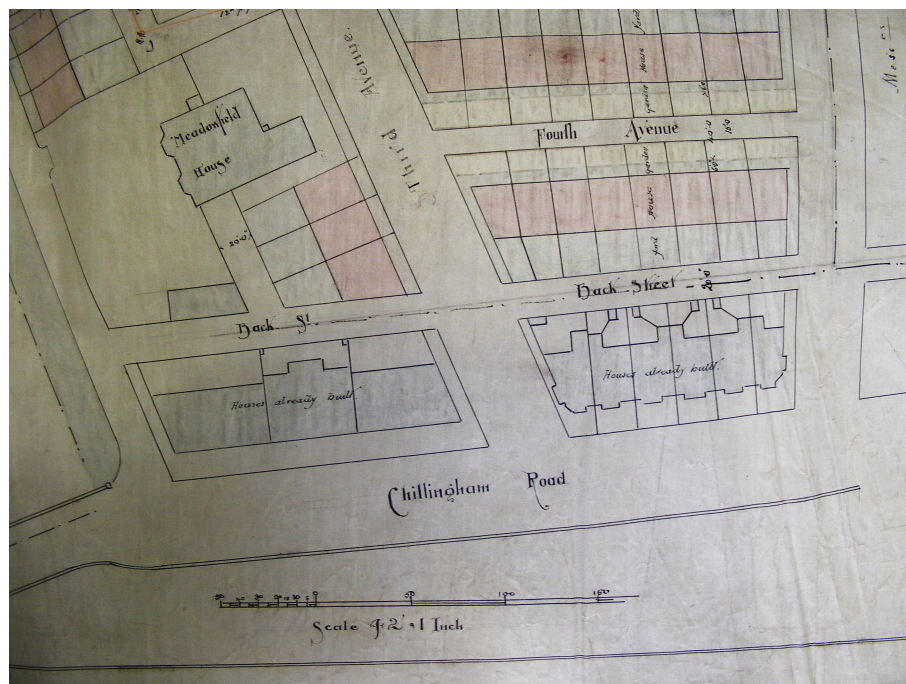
Meadowfield House (Vendor's Plan T186-V285, from 1886)
